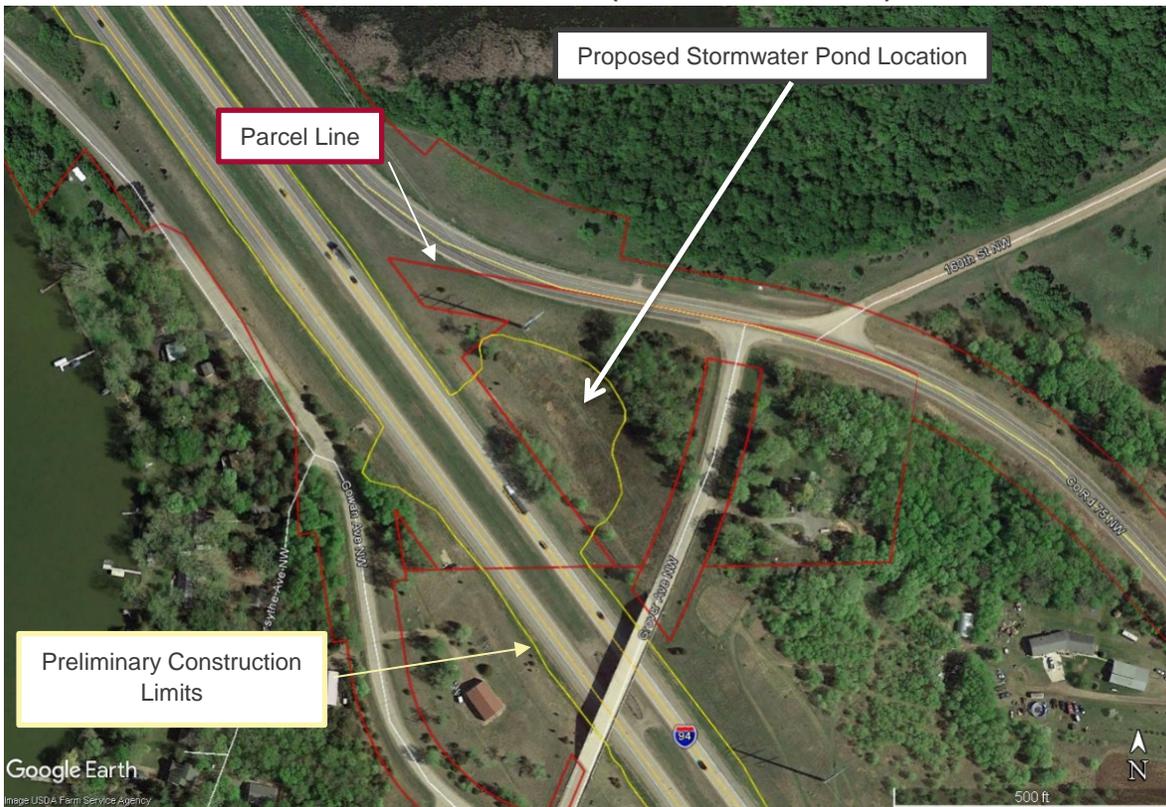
Pond 3 Location Showing Disturbance (Aerial Date 5-16-2011)
